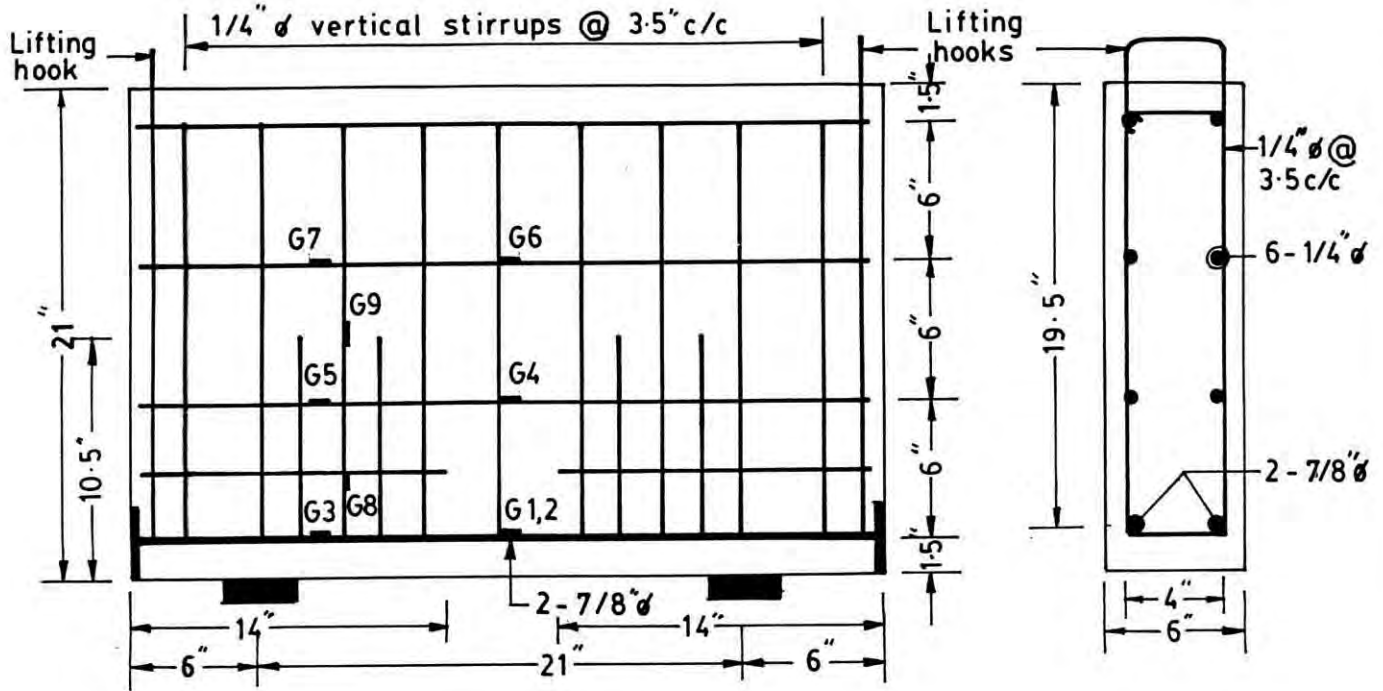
Reinforcement arrangement of beam DB-P5
